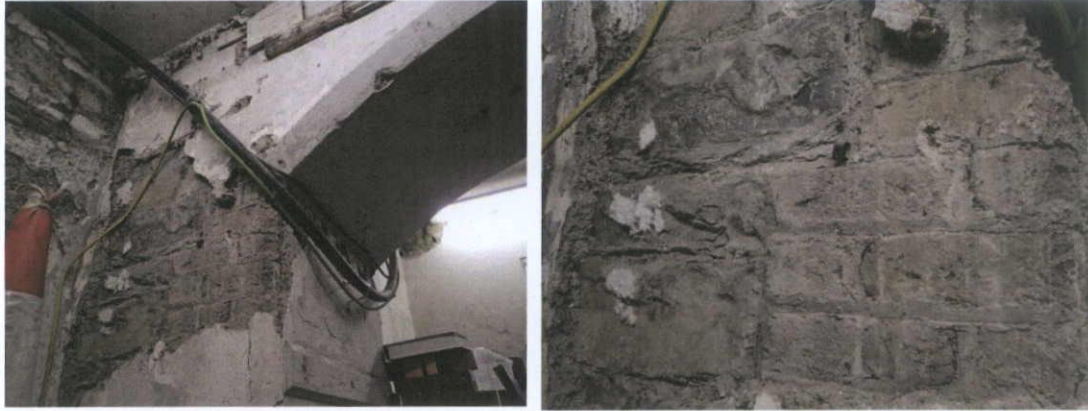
View of a brick pier at the front of the property at basement level, with a rendered Calp limestone masonry wall.
